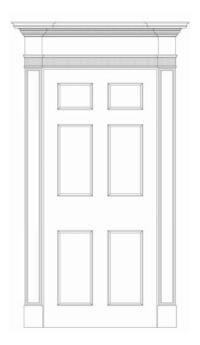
A-14. Typical Federal style door surround. Gideon Tucker House, Salem, MA, 1806. (drawing from Smith and Mudrick, *Federal Style Patterns: 1780-1820*, p. 43). Not to scale.
